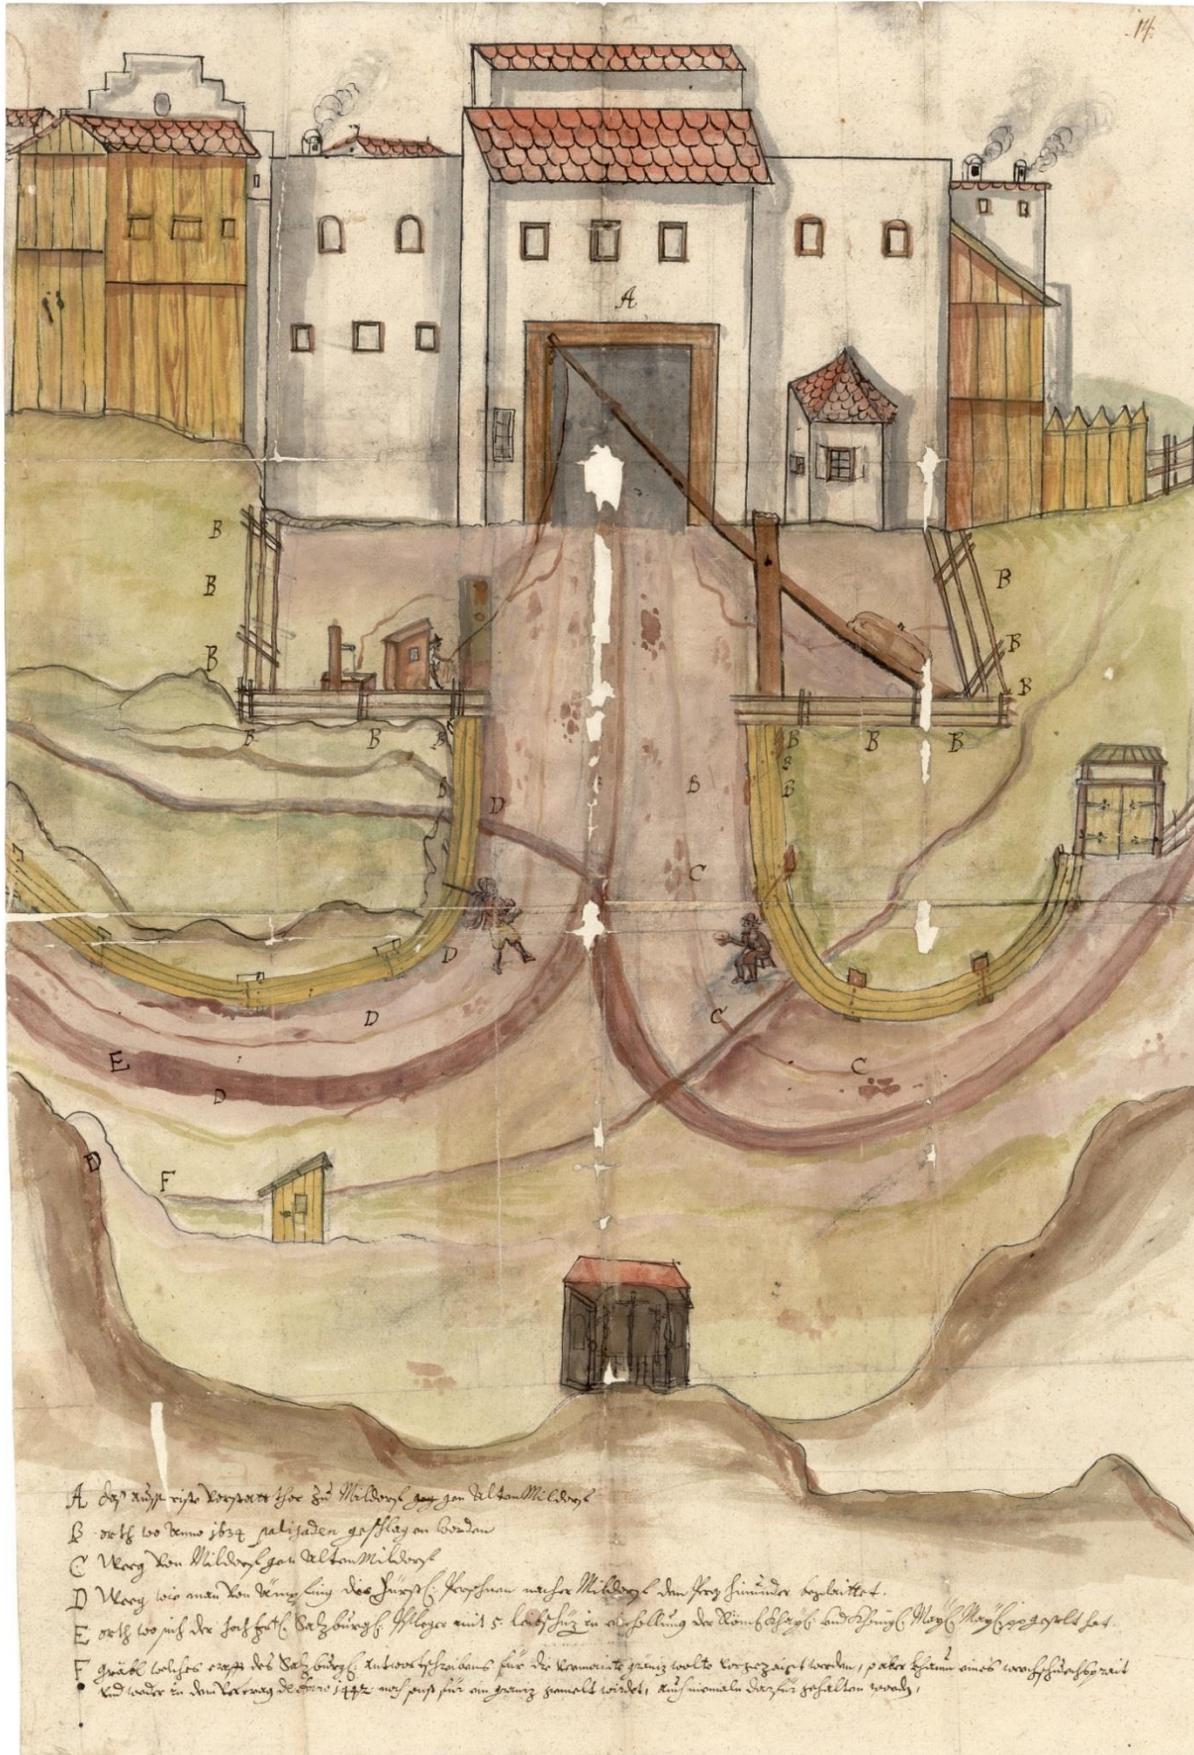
Painting of the outer upper city gate of Mühlendorf from 1654 (BayHstA München, Plansammlung, 11541)
